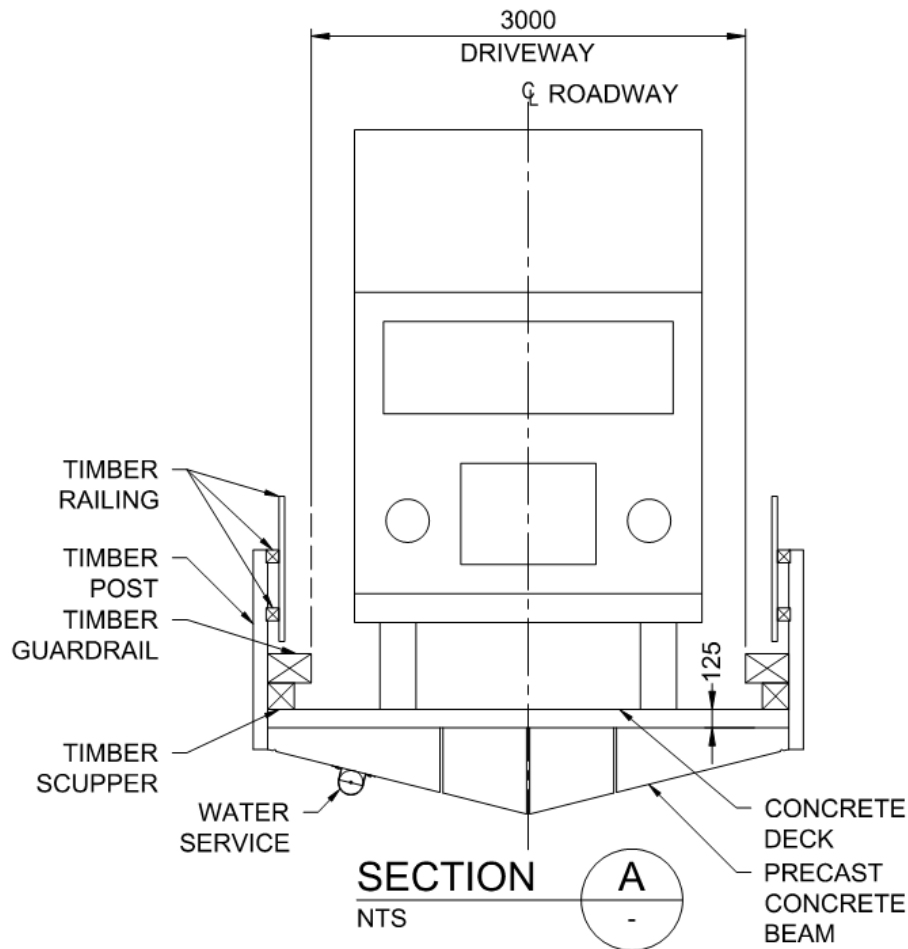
Lions Bay Avenue Bridge over Alberta Creek (Driveway) – Section
